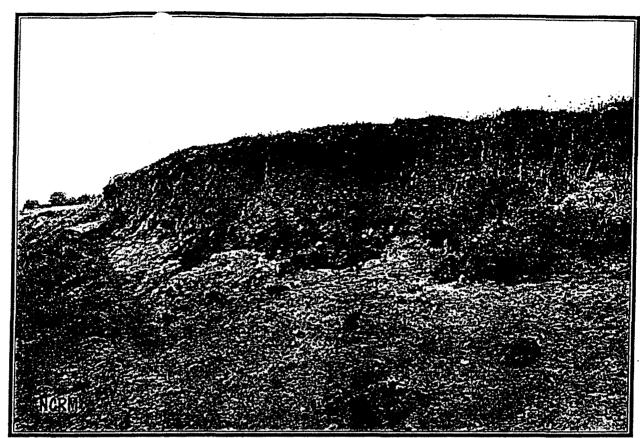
Detail of the "bench" formed by the erosion of the top soil into the through-cut formed by the railroad grade. Again note darker intact soils overlying bedrock. Viewing northeast.
